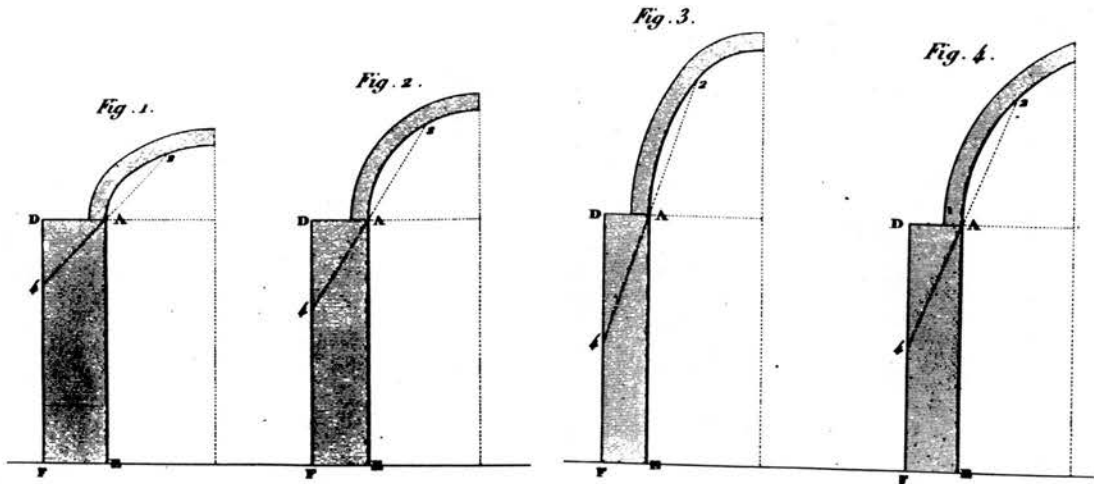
Dérand's method of abutment design (Appendix I section 4.4)
